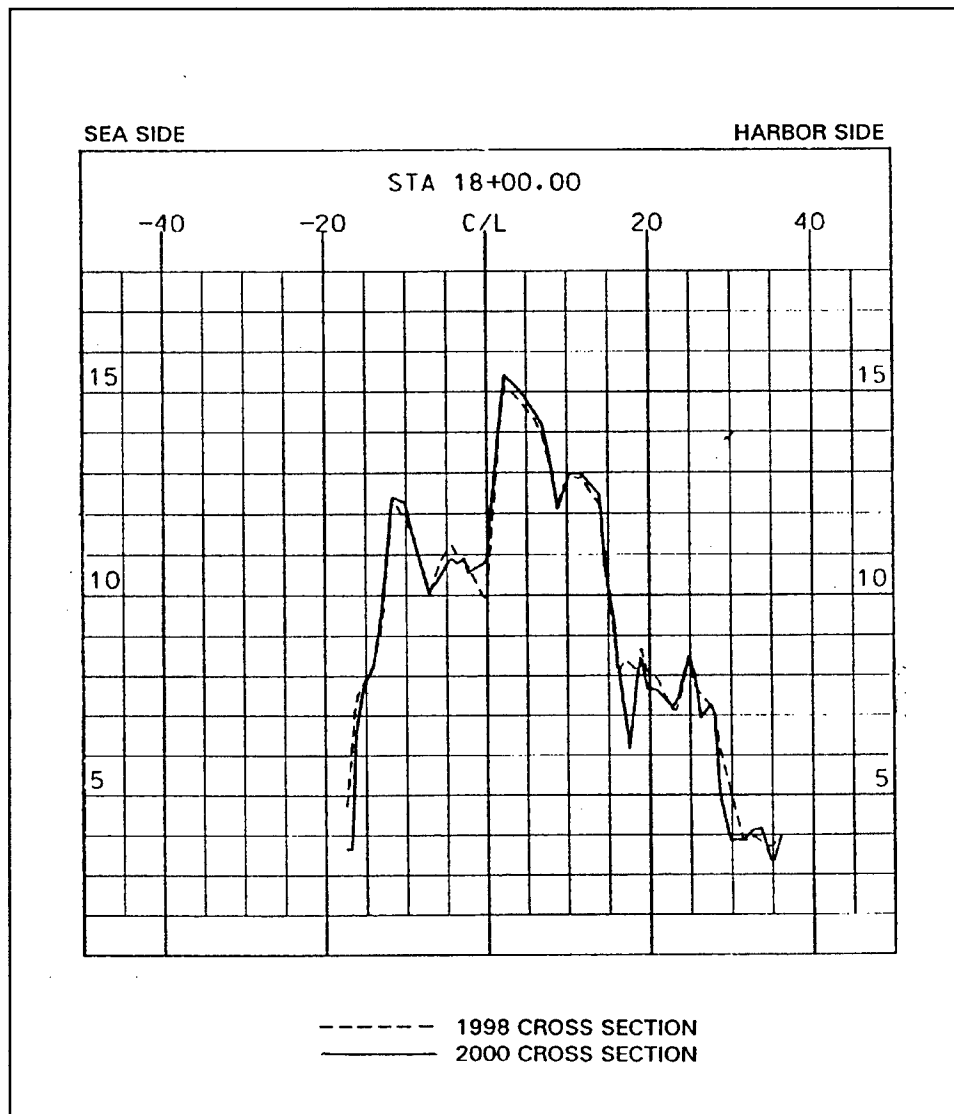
Cross sections of Morro Bay outer south breakwater, sta 18+00
